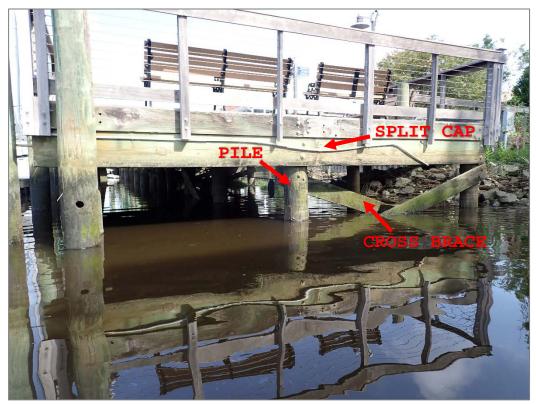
Typical Bent – Southeastern section, 12 foot wide (Sta. 0+00)
